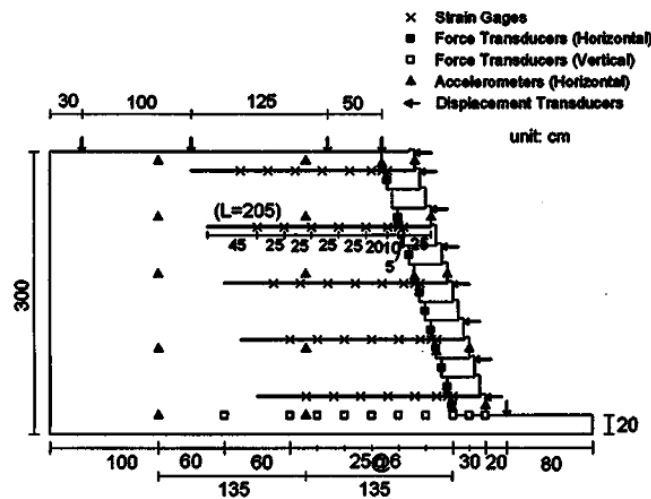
Model Wall Layout and Instrumentation (Ling *et al.*, 2005).
